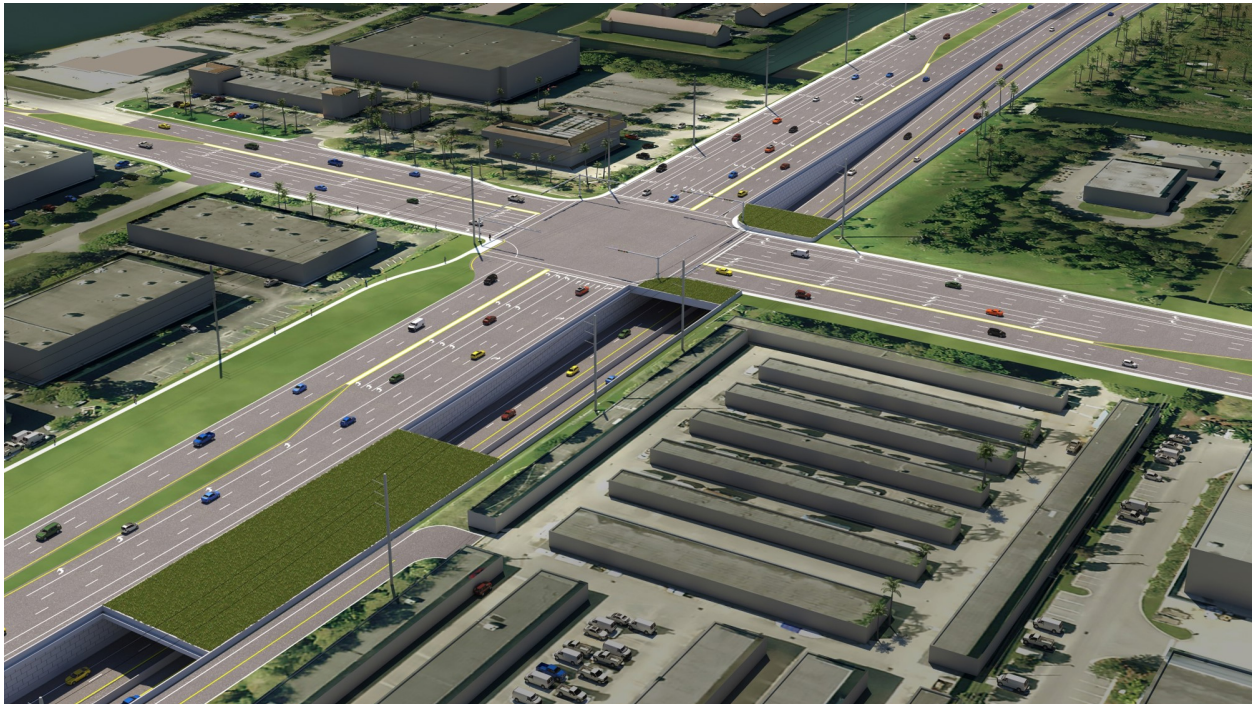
North Alternative-Looking West at SW 28th Avenue Intersection
